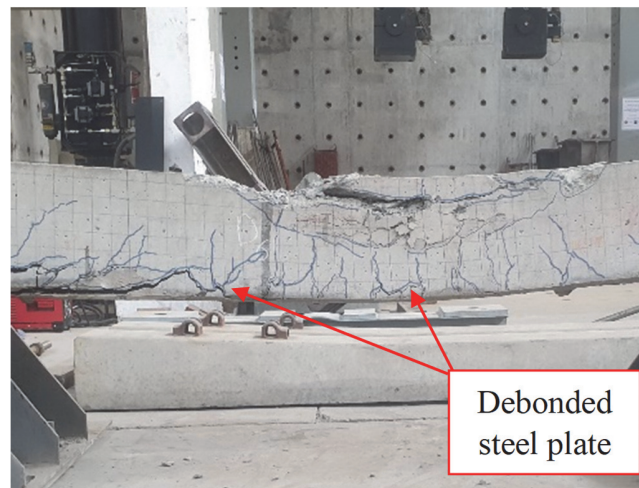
Peeling rupture of steel plate due to concrete sliding.
